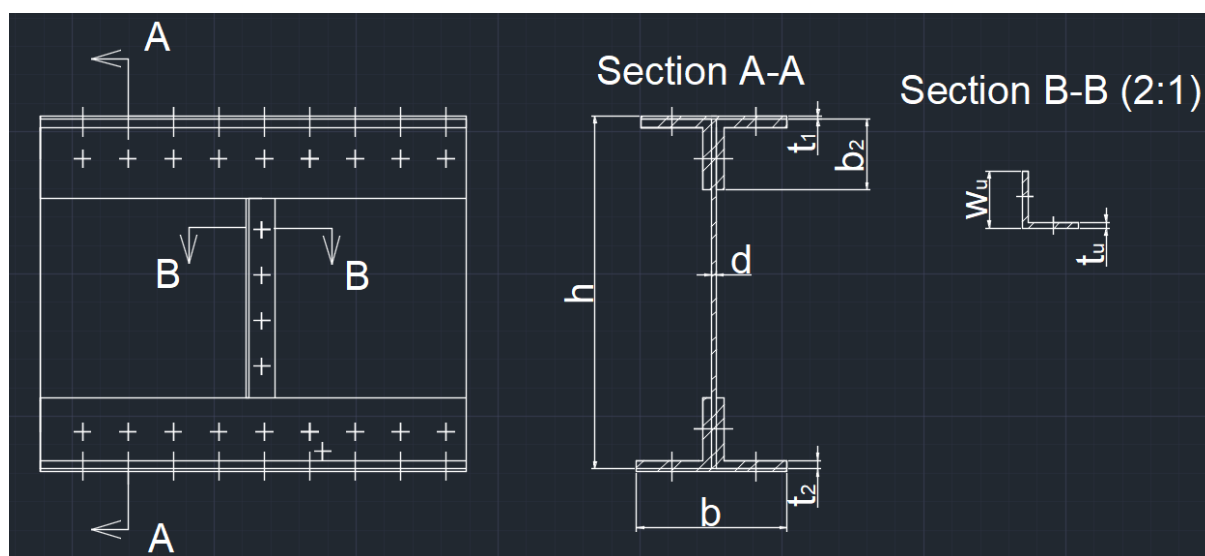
Scheme of the geometric section of a build-up beam.
